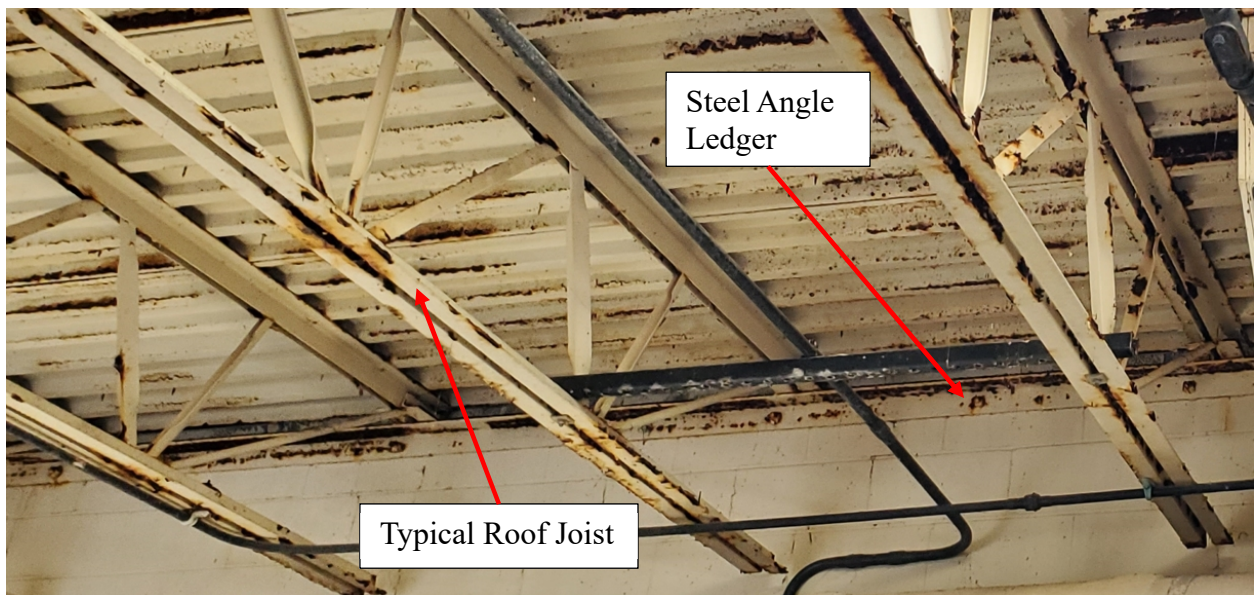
Roof Joists Bearing Perpendicular to the Wall
